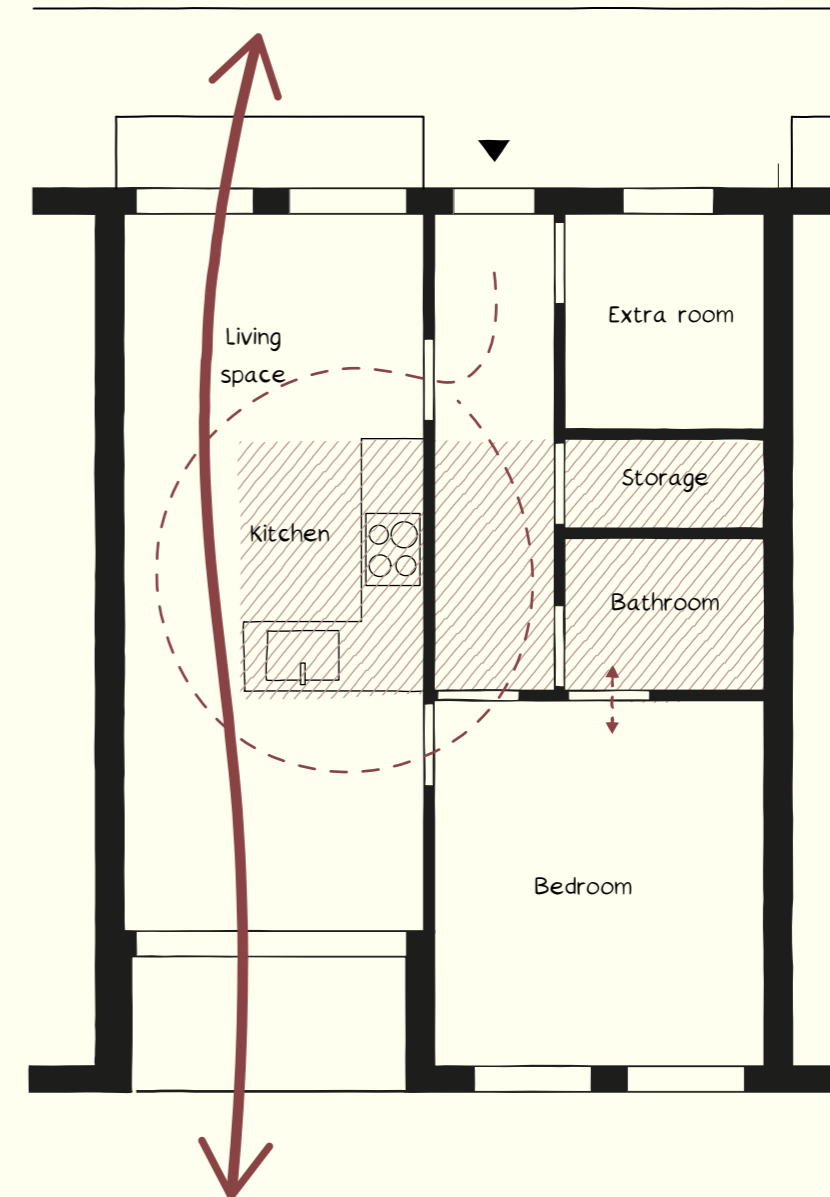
Conceptual floor plan of a porch-access apartment (own figure)
